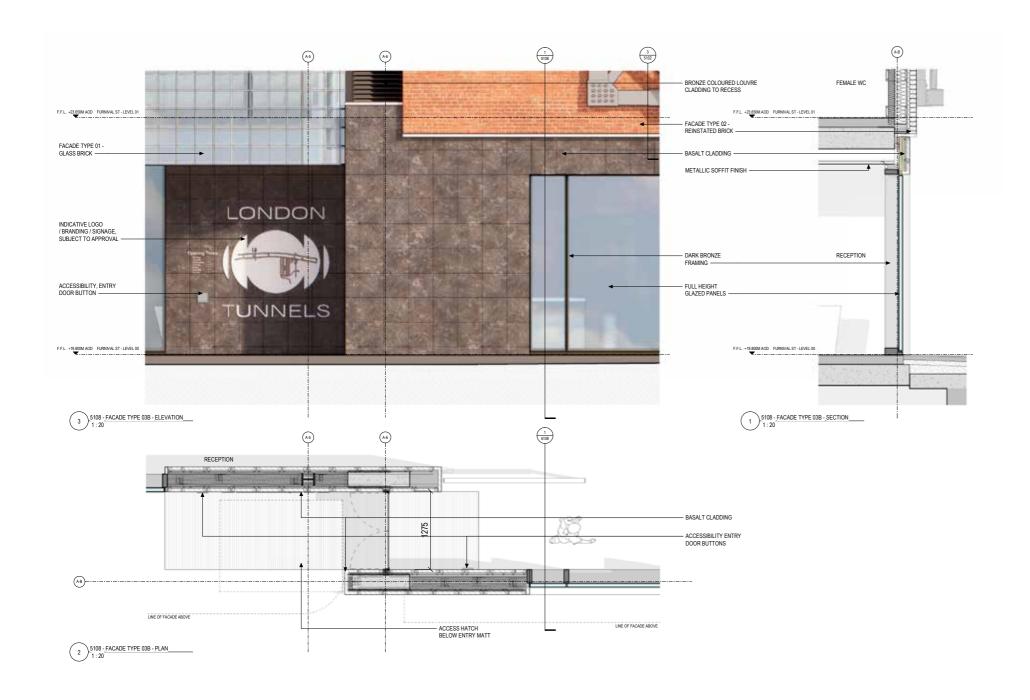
Ground Floor facade details: Elevation, Plan, and Cross Section
